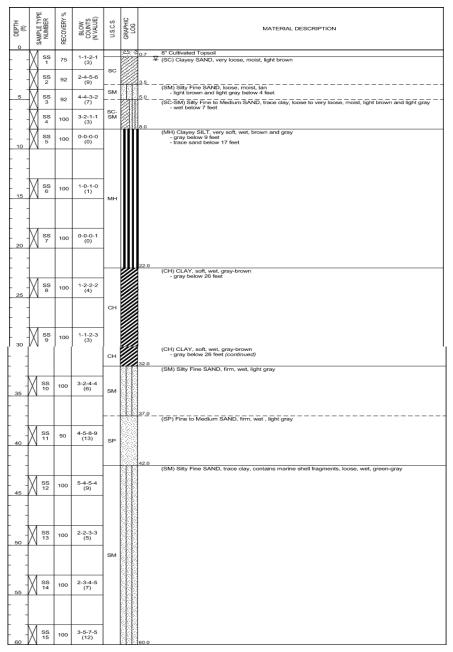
Typical section of an SPT boring record of the subsurface conditions encountered
